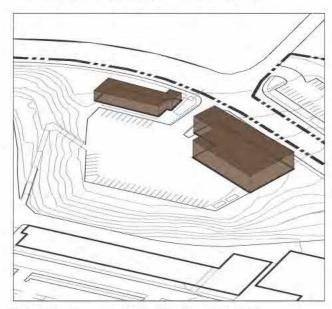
Axonometric and Site Plan of new M&O buildings
